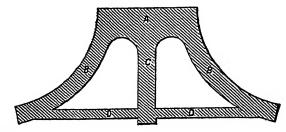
B. Horizontal section of an abutment, A; with curved wing-walls, B;
